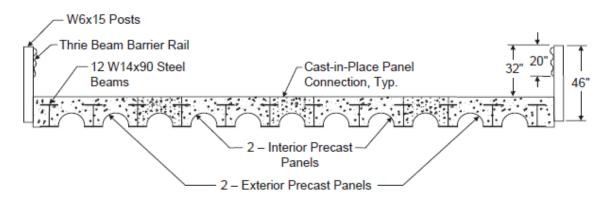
Typical cross section of a completed PMBISB (Konda, 2007)
